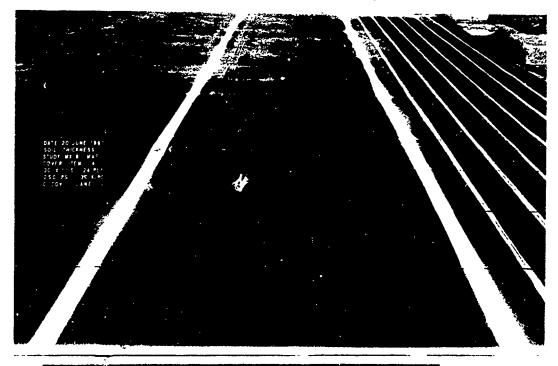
Test section II, lane 1, item 2, after failure at 170 coverages
